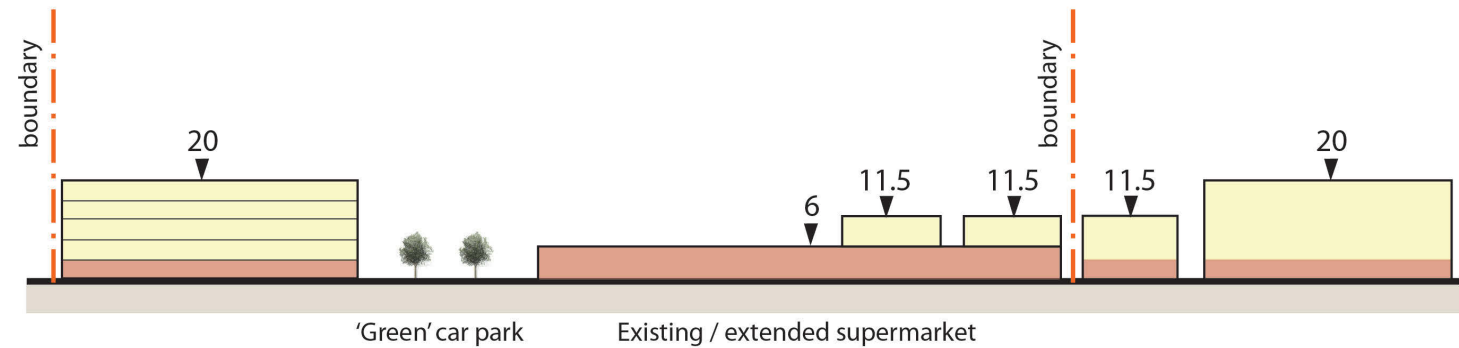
Indicative concept section B-B for Development Site 5 - Long term vision (not to scale)
